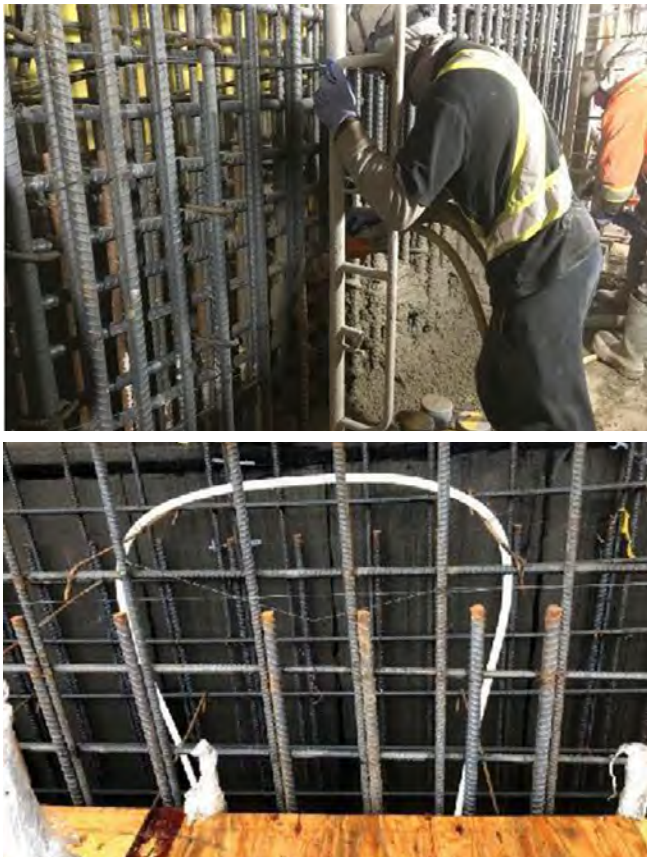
Top - A mass structural wall for a sewer treatment facility constructed with mass shotcrete. Bottom: Two layers of 25M rebar with cooling pipes at 1.0 m spacing were constructed with mass shotcrete
